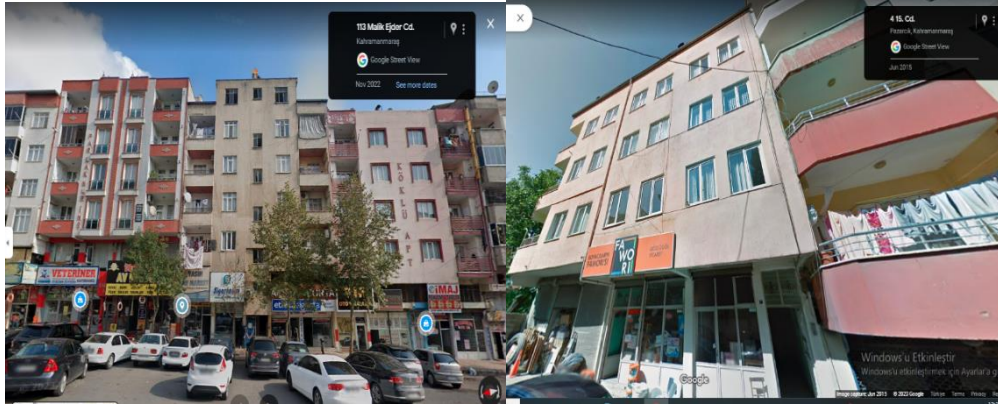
10: Slab levels in the building layout/adjacent buildings under investigation
